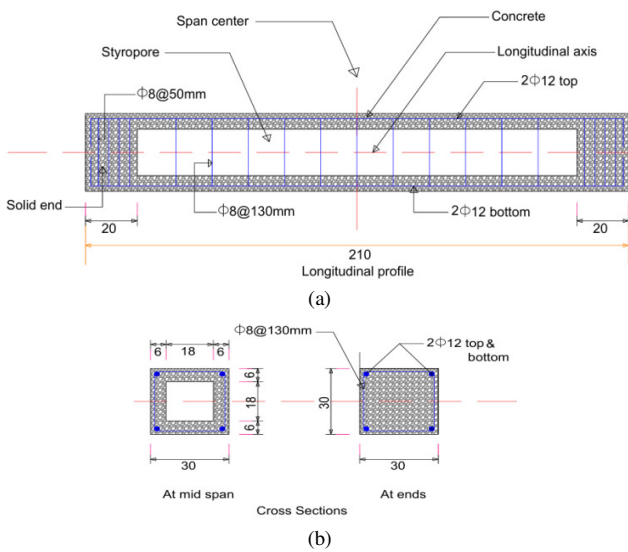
Details of the tested reference beam (1NR). (a) Longitudinal profile and (b) cross section.
